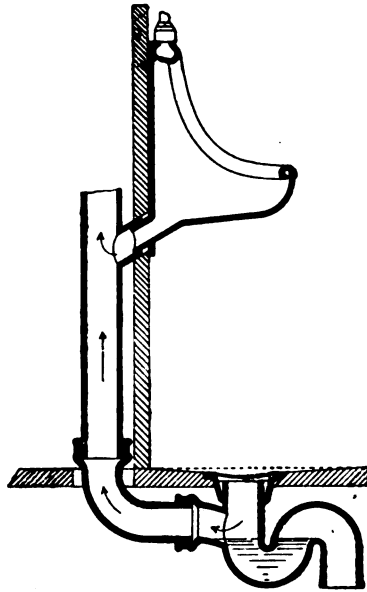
Locally Vented Trap for Urinal and Floor Drain Combined.
